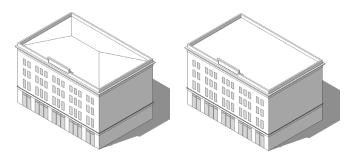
G.2.a.ii: Hipped roof with parapet (left); flat roof with parapet (right)
